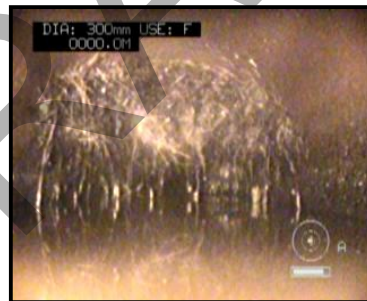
Root Mass at manhole to pipe interface MH 186
